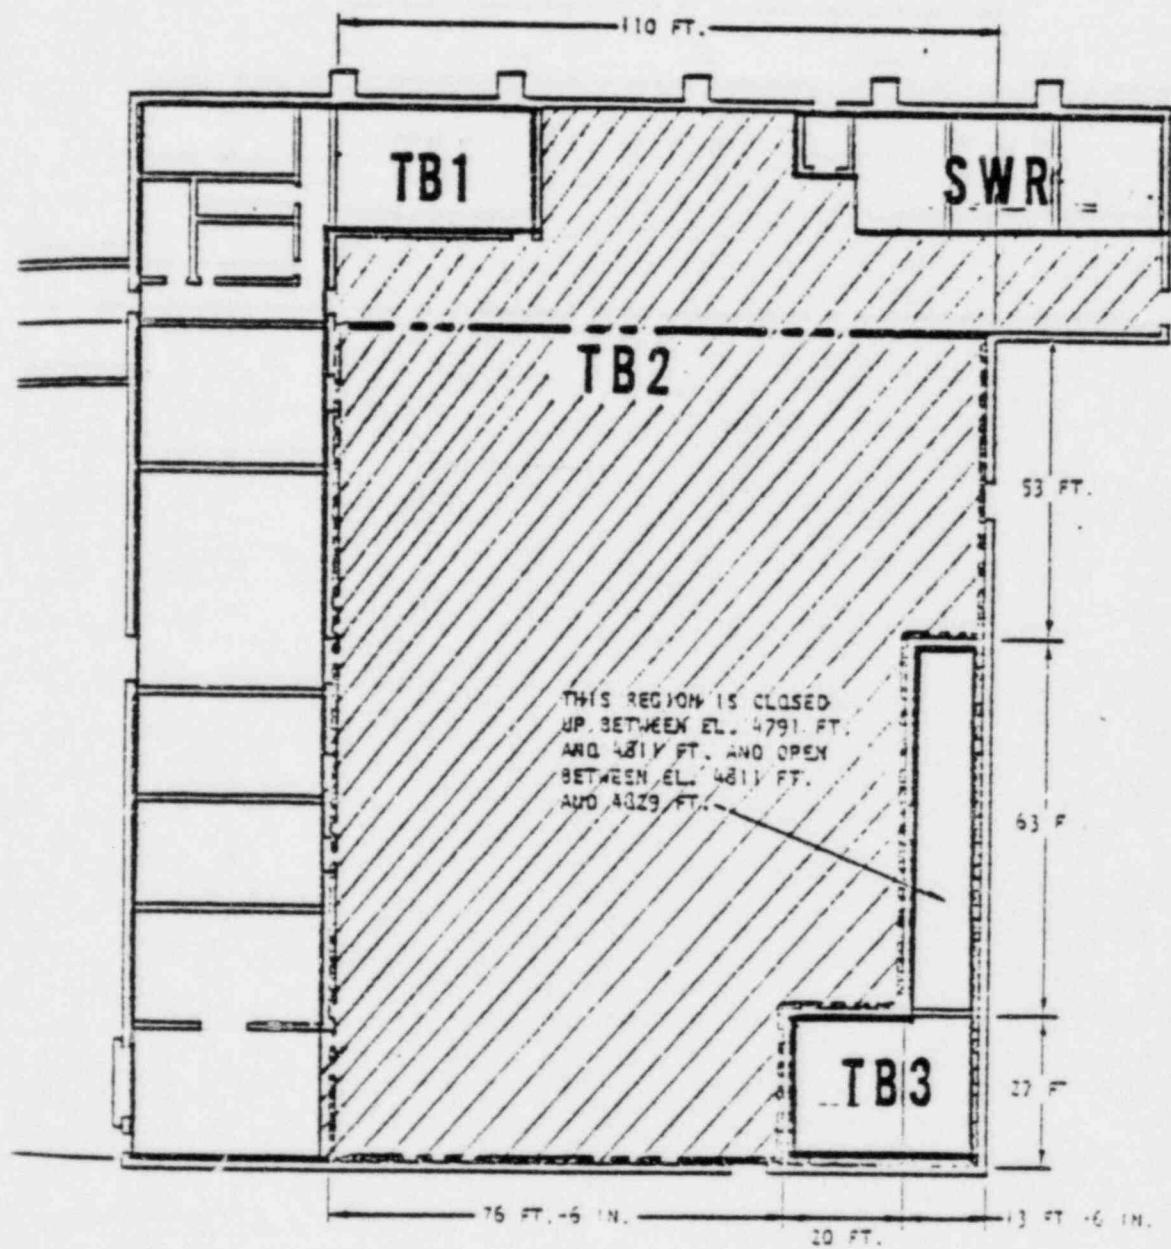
Turbine building plan view at elevation 4791 ft showing region of detailed analysis
